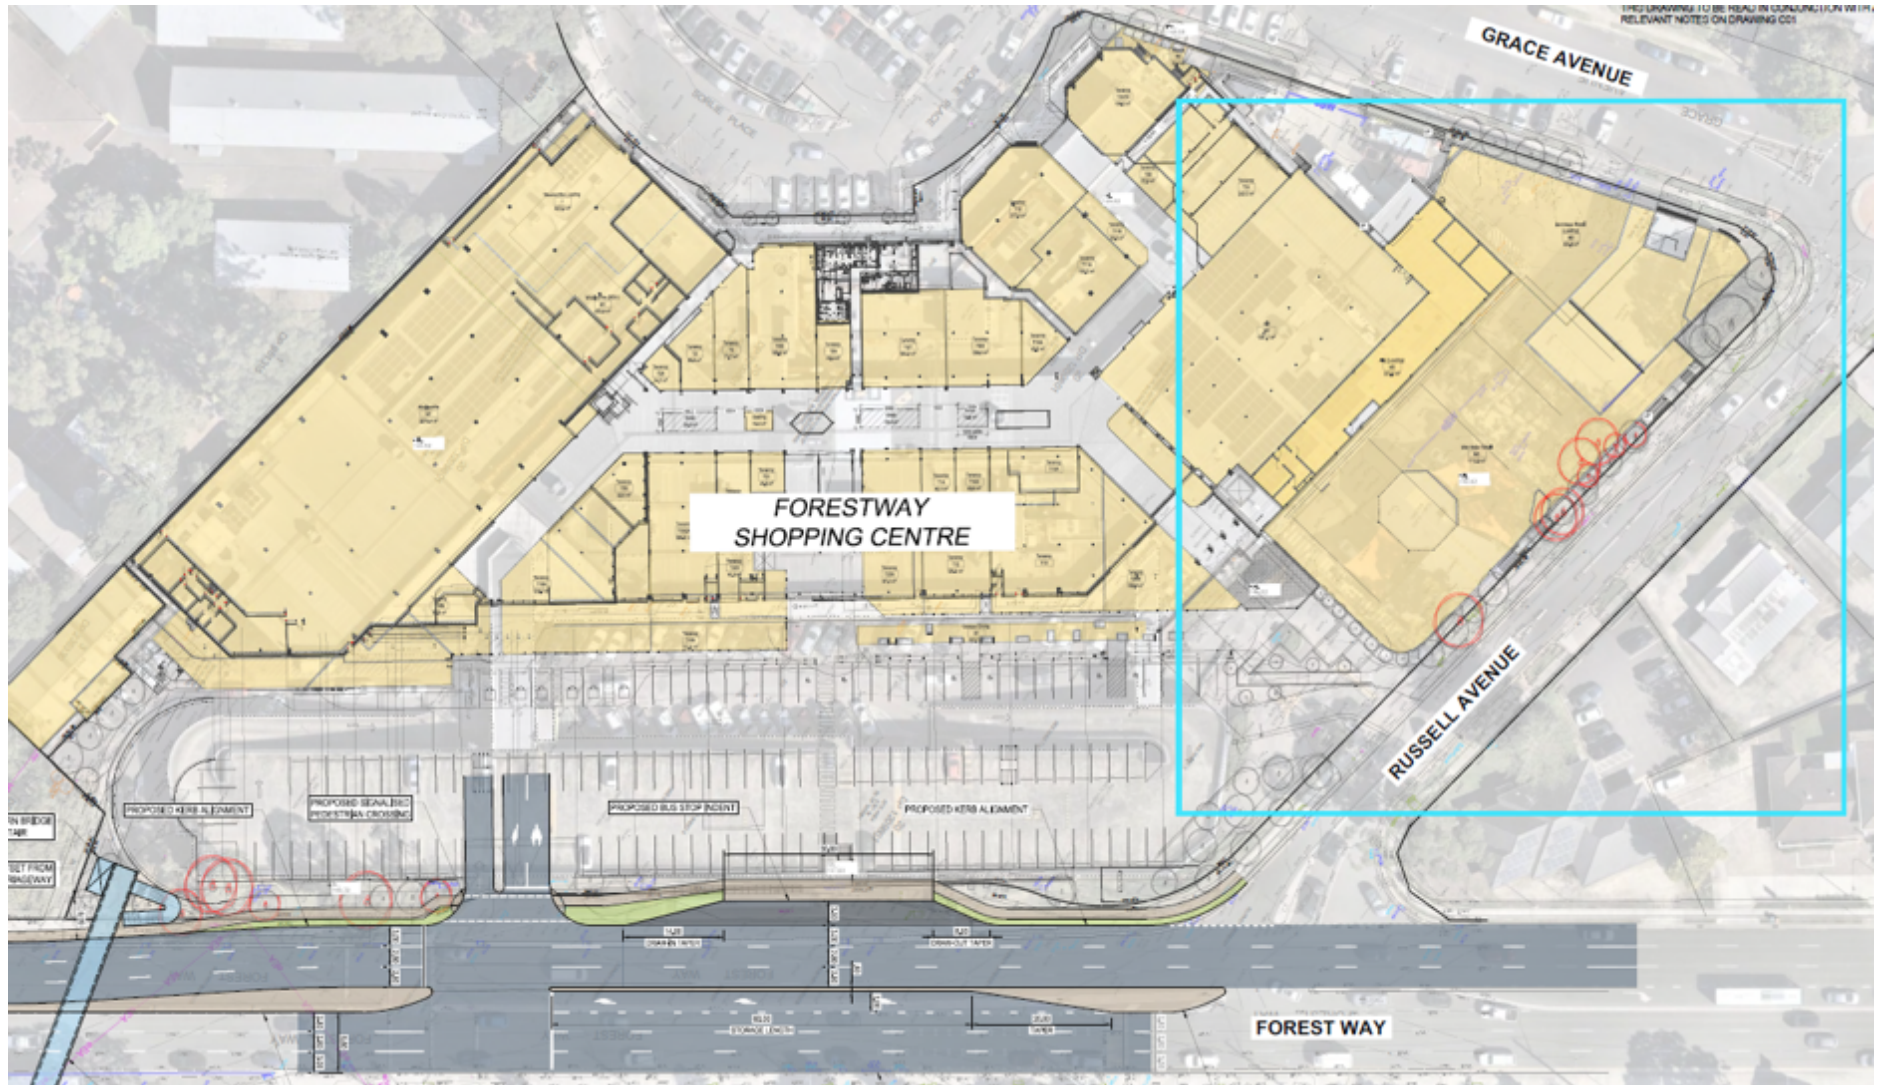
Tree Location Plan by Nettleton Tribe for 22 Forest Way, Frenchs Forest, NSW 2086.
